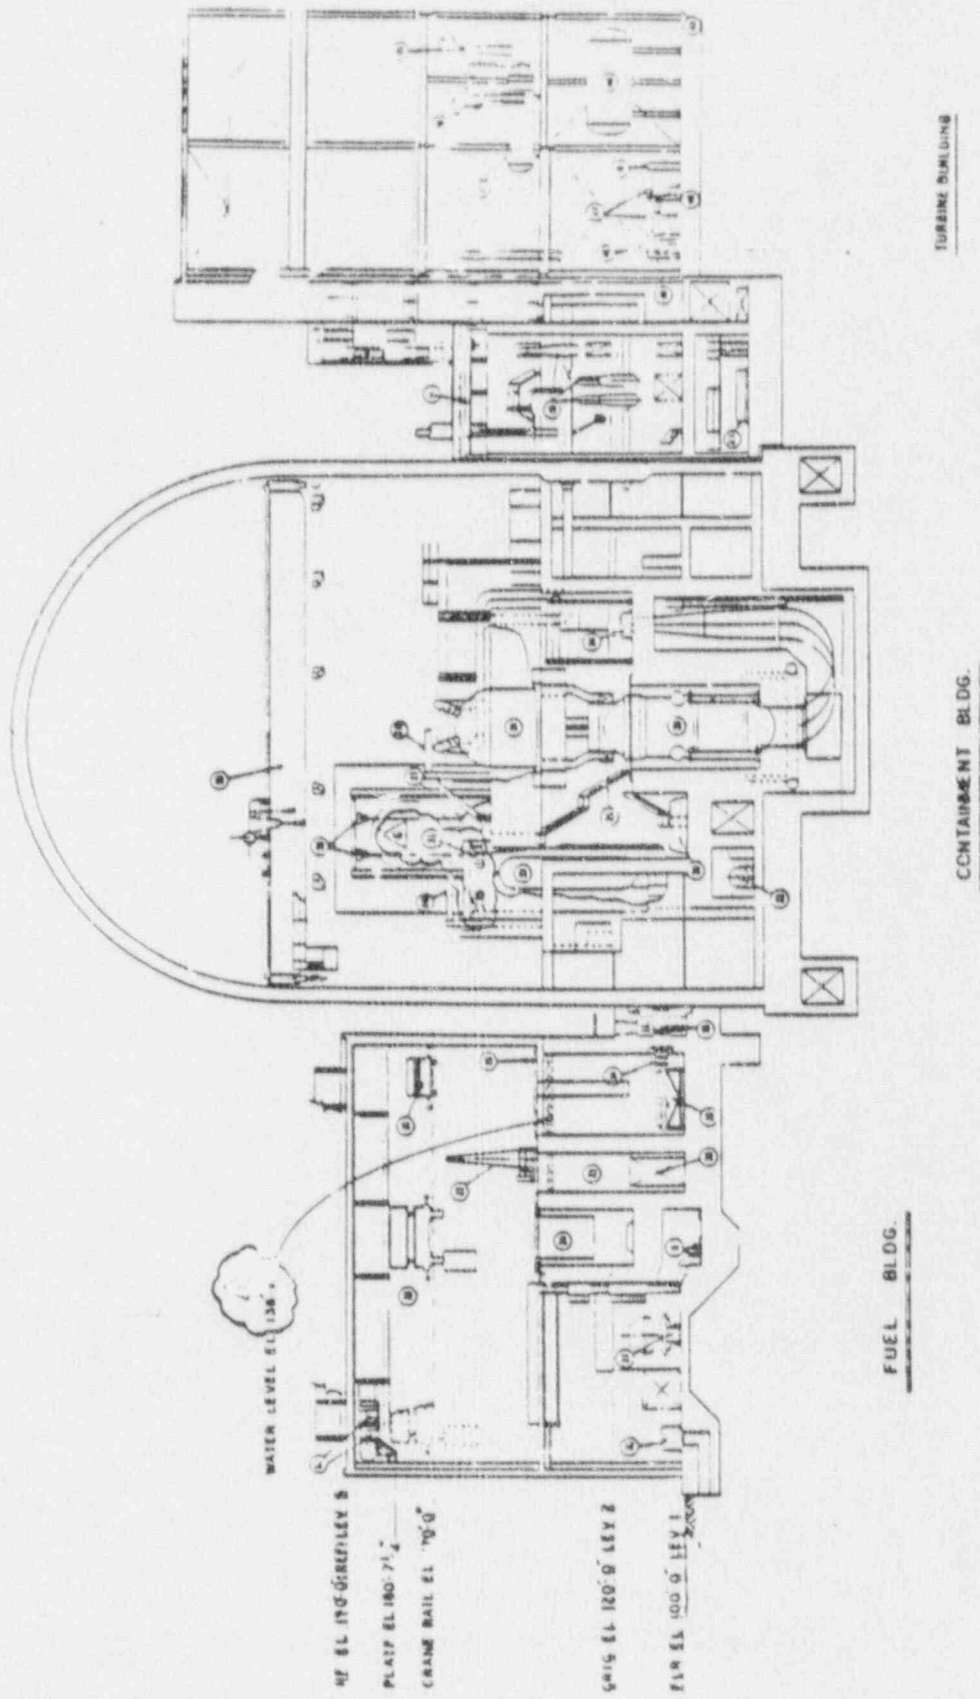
Elevation View of the Containment and Fuel Buildings and Partial Turbine Building at Palo Verde
